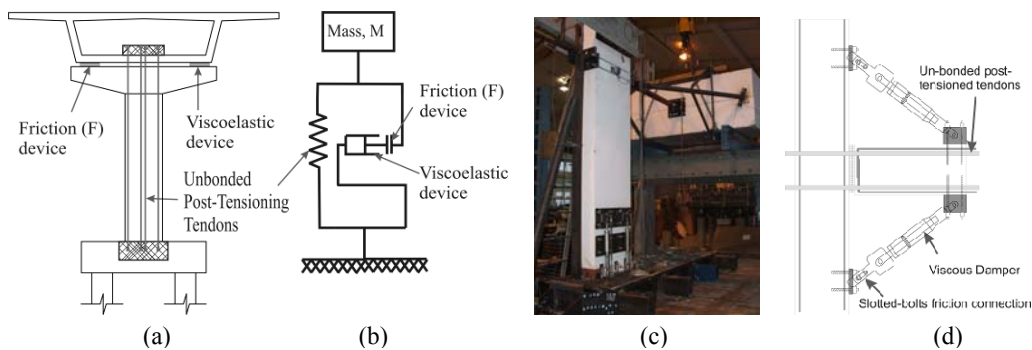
a) AFS Bridge Pier b) Schematic spring-mass SDOF model c) Shake table testing of AFS Structural Wall (Marriott et al., 2008) d) AFS Beam-column Joint
